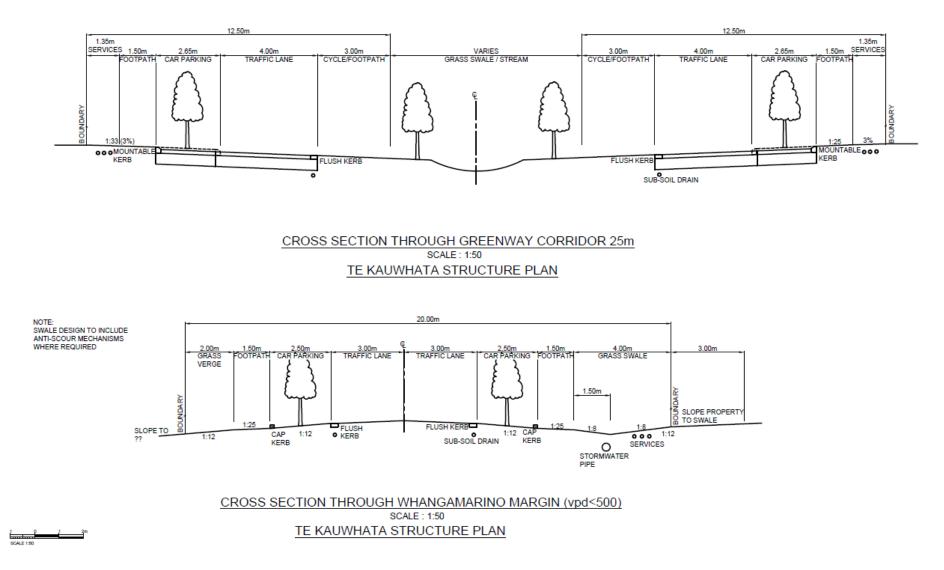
Te Kauwhata Structure Plan – road cross sections – local roads
